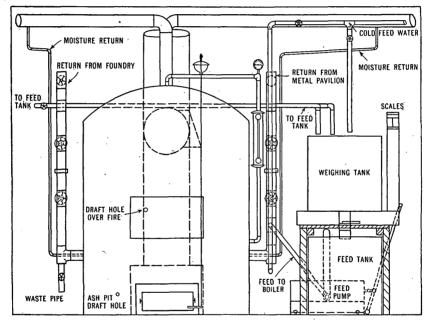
Elevation of house-heating boiler plant at St. Louis, Mo.
